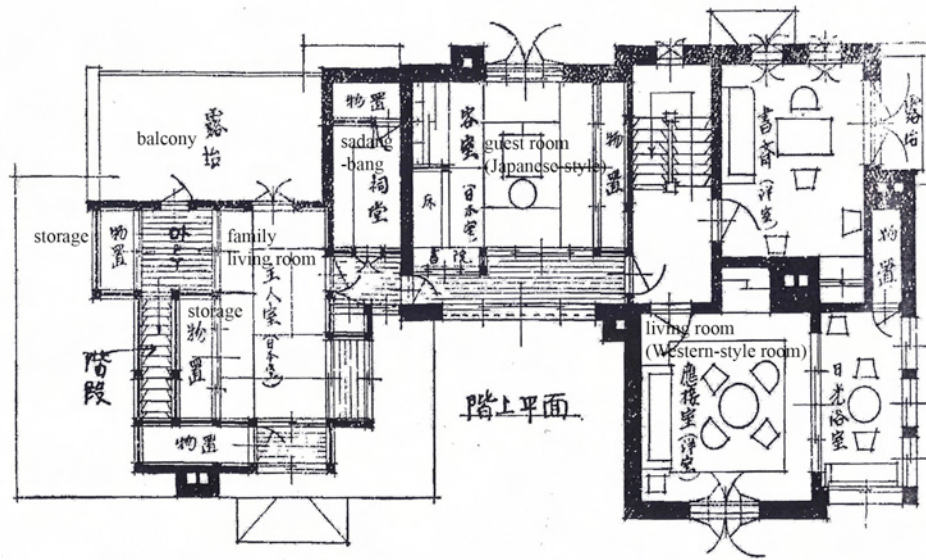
Ground floor plan, L's housing; from Park, "Aelssi jeoui gyehoeggaeyo," 84.
